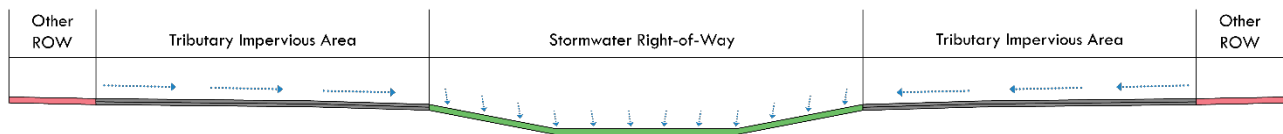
Example Cross Section - Stormwater Right-of-Way in Median
